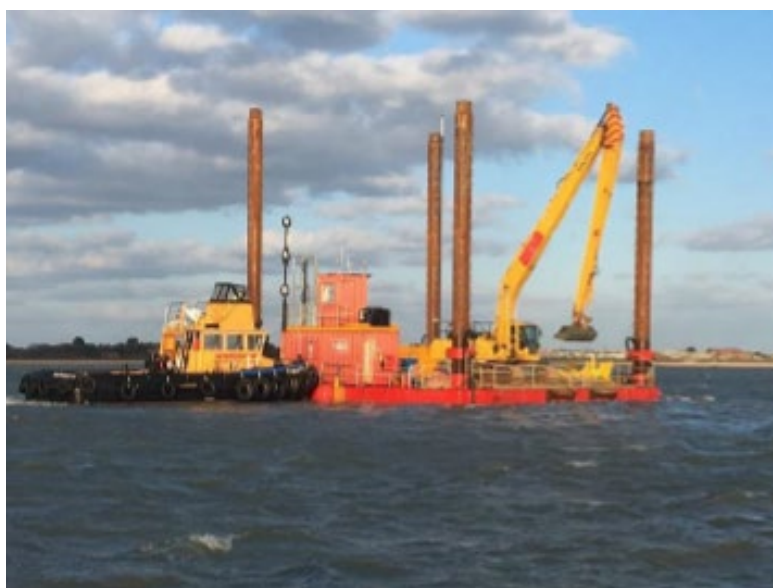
Example of a jack-up barge with backhoe excavator (Source: Equinor)
